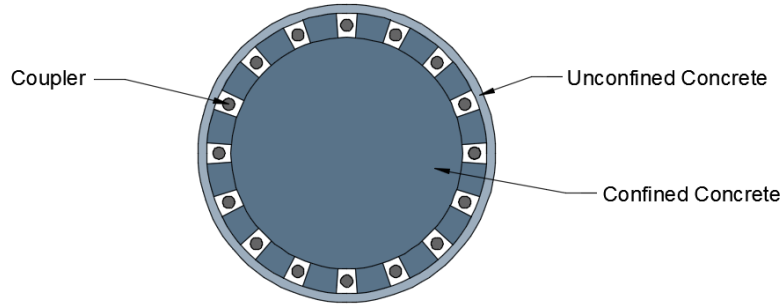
Parma Bridge OpenSees Model of Column Cross-section with Grouted Couplers
